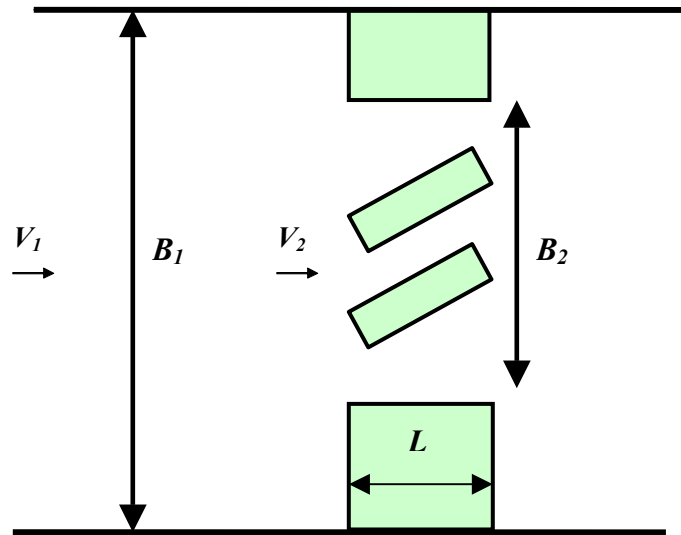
Plan-view of Complex Pier Scour and Contraction Scour
